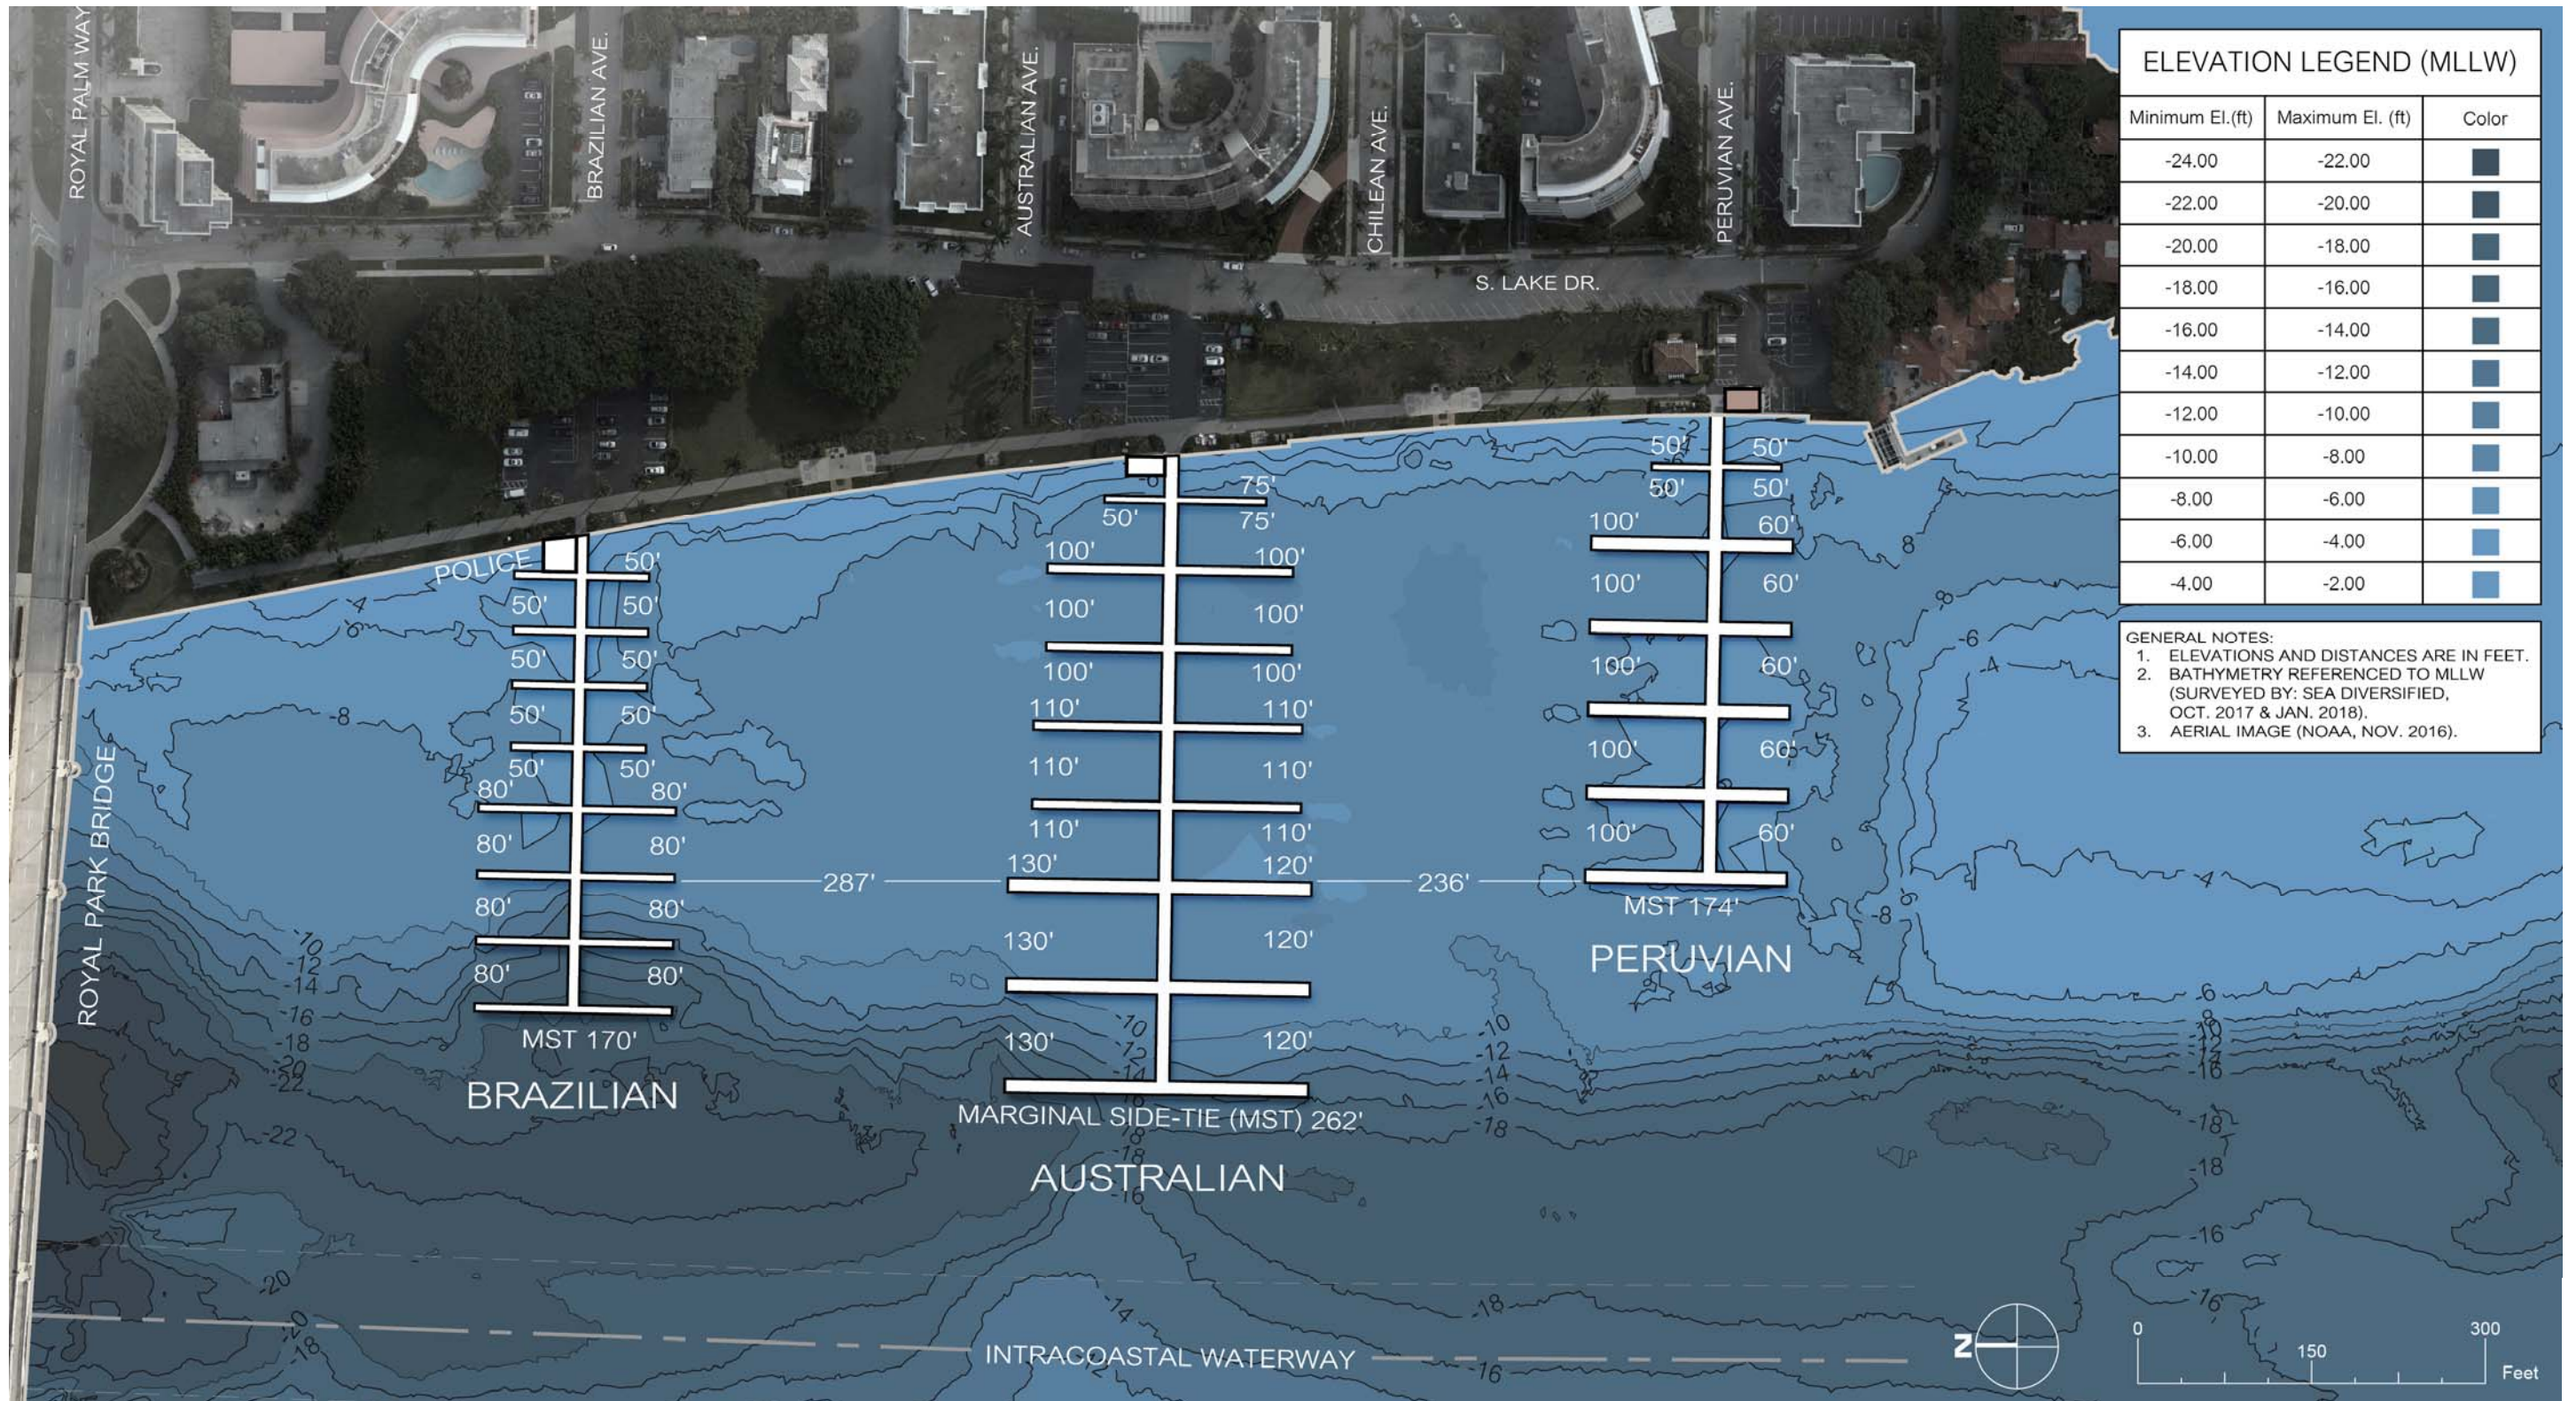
Existing Conditions of Dock Layout and Bathymetry
